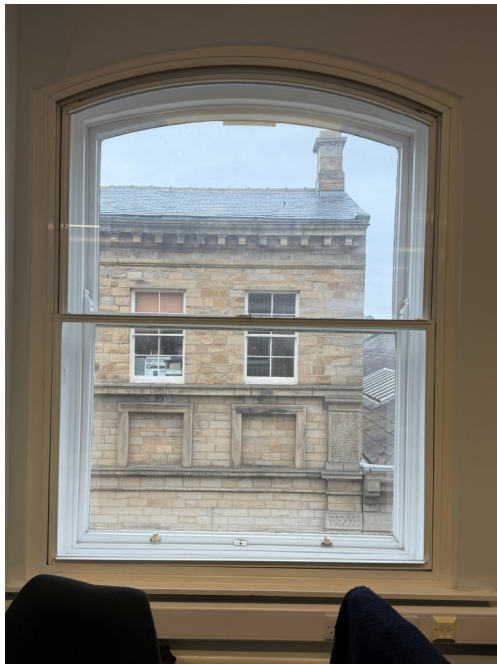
Existing secondary glazing installation demonstrating how the central meeting rail aligns with the historic window fabric and is largely imperceptible externally.
